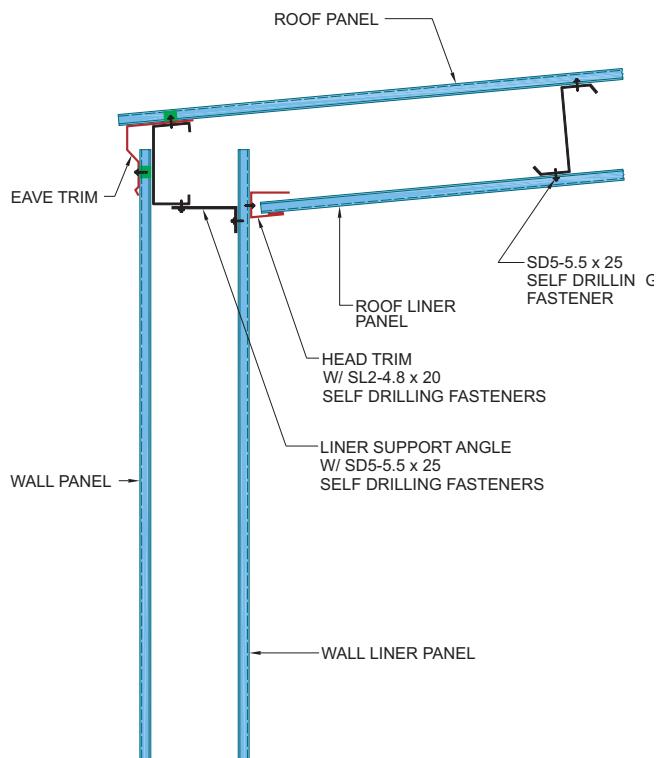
DETAIL : LINER NOT AT FULL HEIGHT OF WALL
